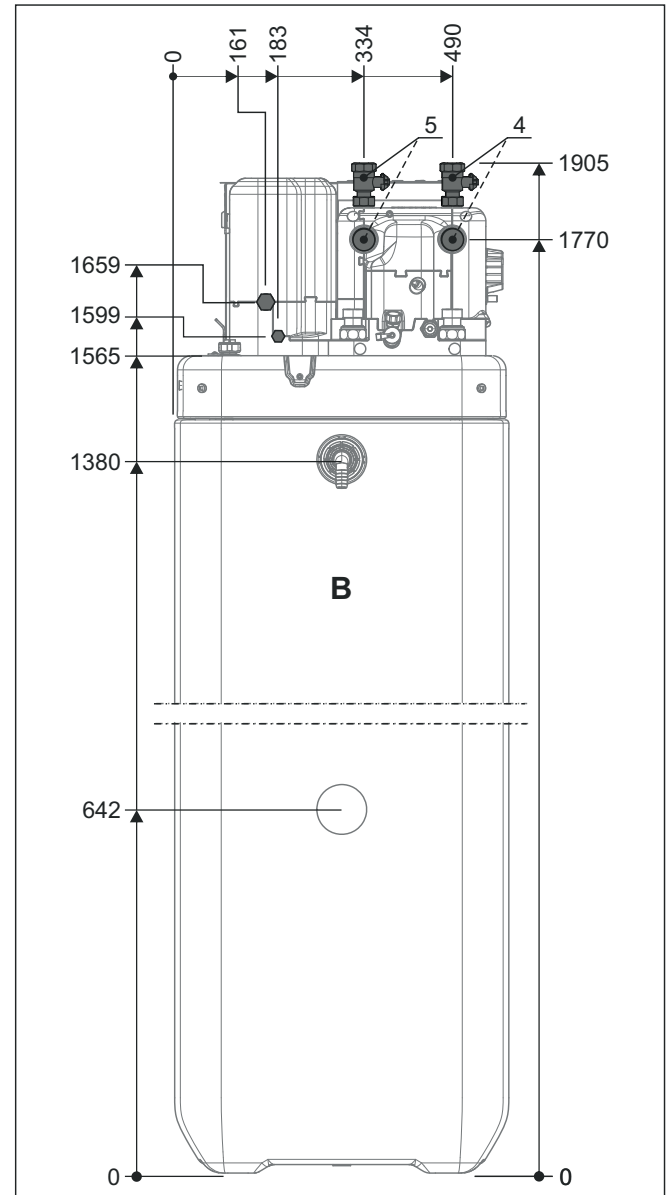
Dimensions, side view - ...04P30D/...08P30D
